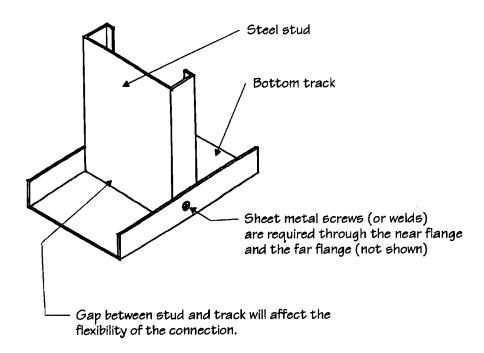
18 STUD TO BOTTOM TRACK CONNECTION DETAIL
